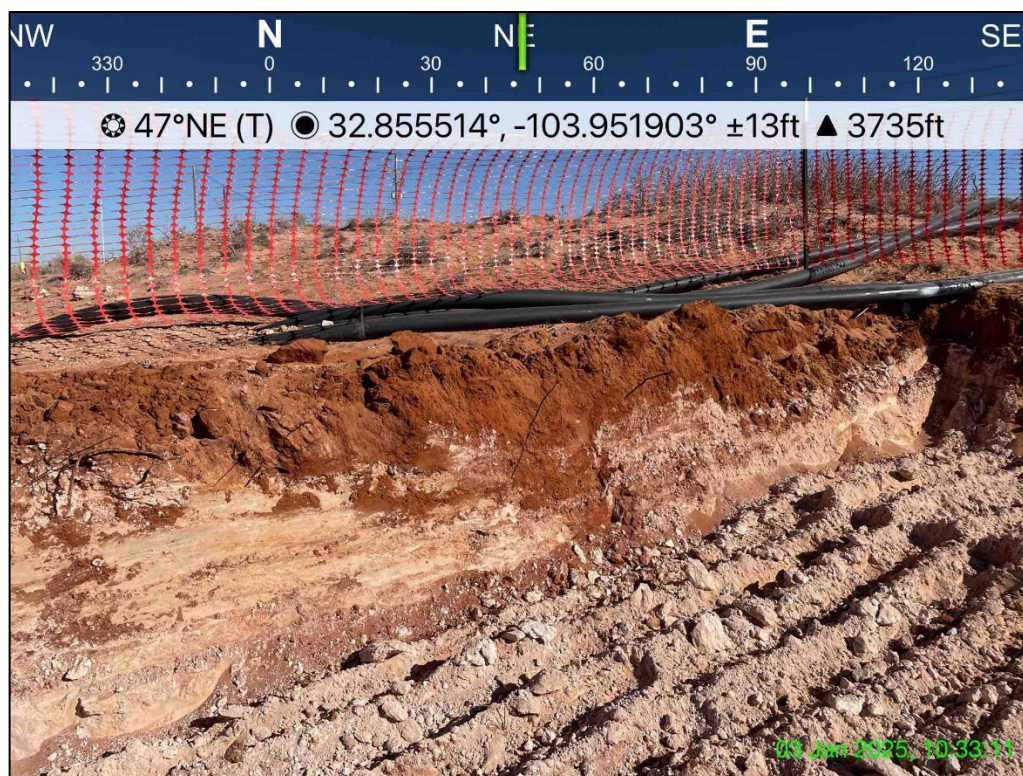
~1 foot of topsoil observed in northeast corner of excavation, facing northeast
